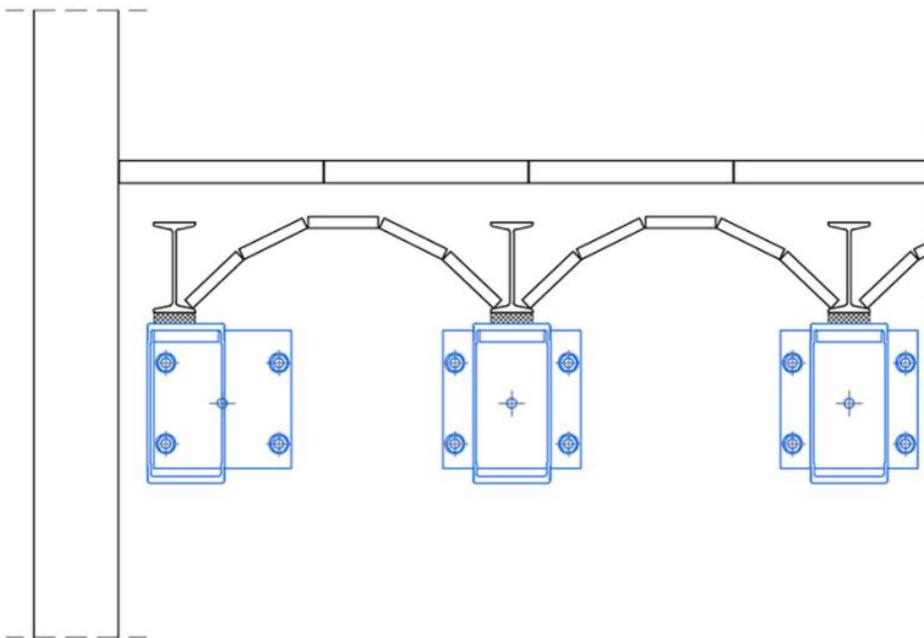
Detail of *beam under beams* installation. ©EXTEND
